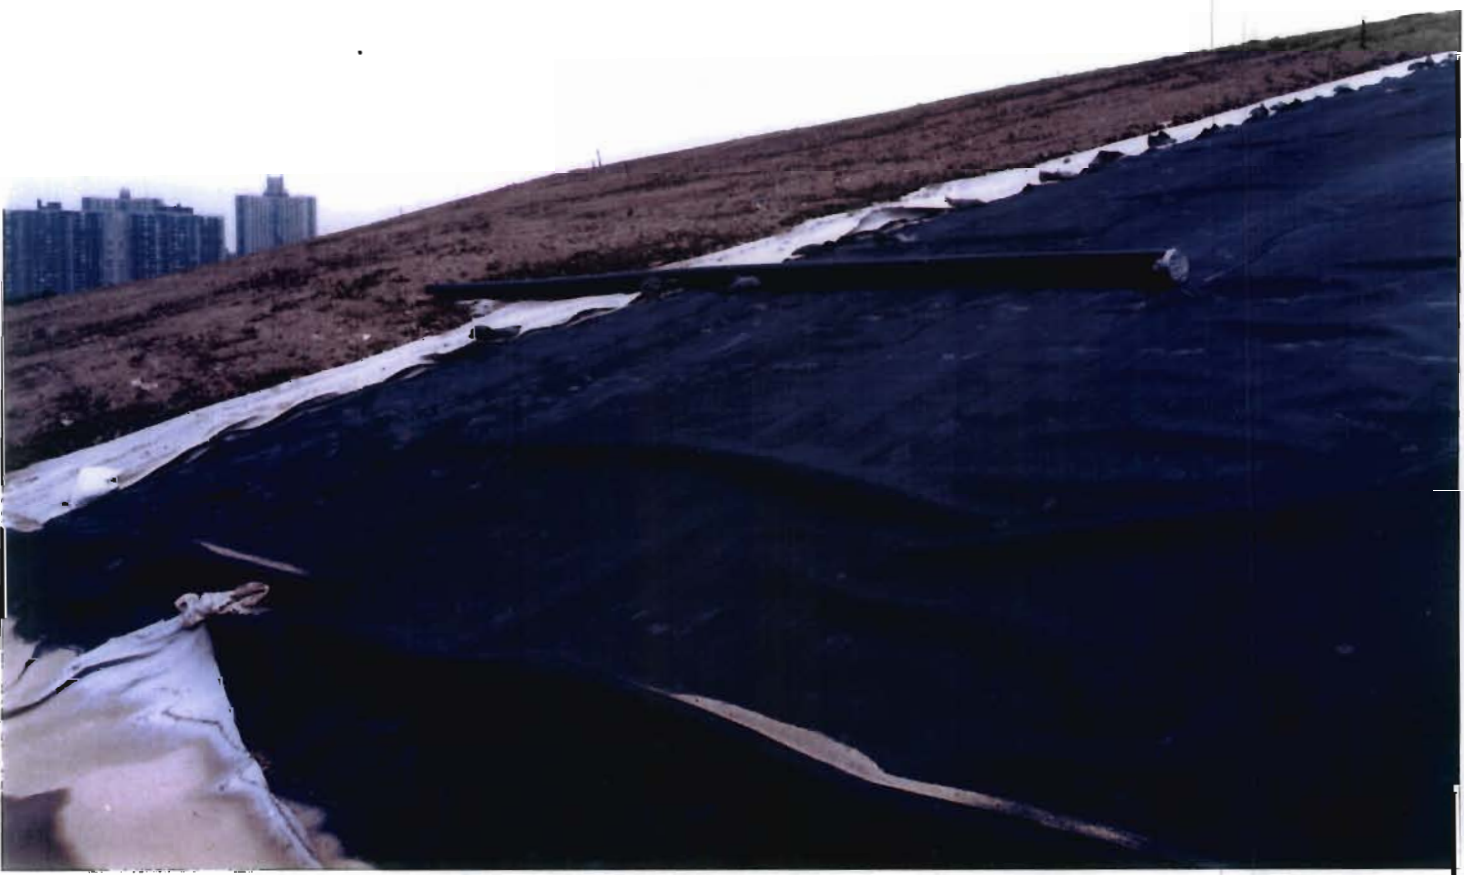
Covering LFG Collection Line with Barrier Protection Material.
